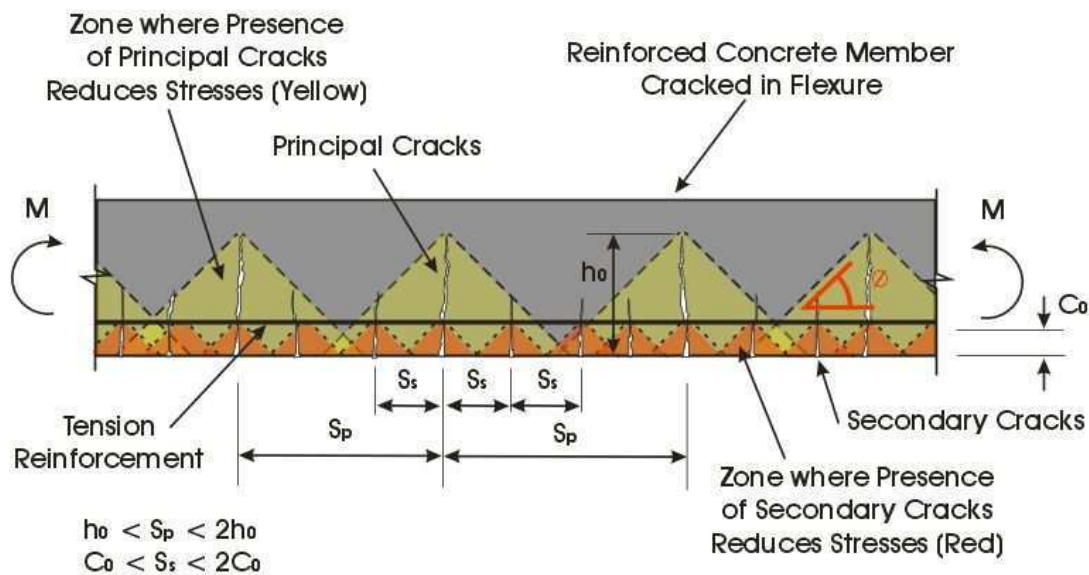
Spacing of flexural cracks in a reinforced concrete beam (Adapted from Dickson 1986)
